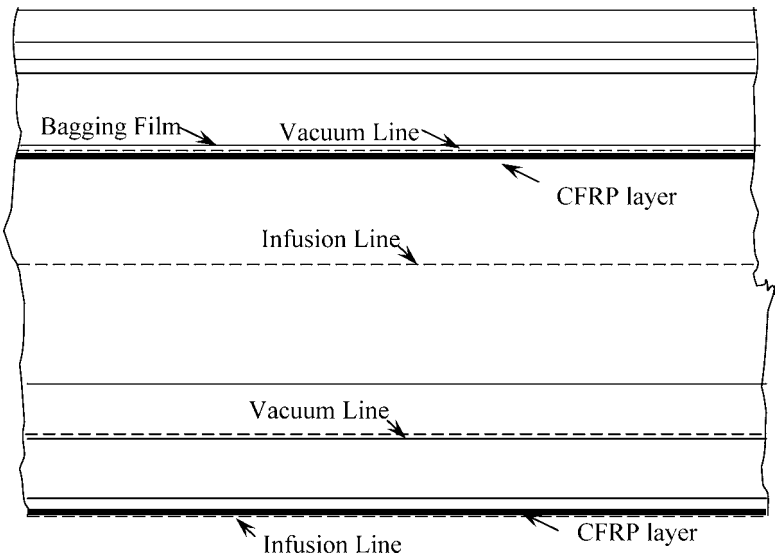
Longitudinal view of the 1600.2 mm (63'') bulb T-girder (not in scale).
